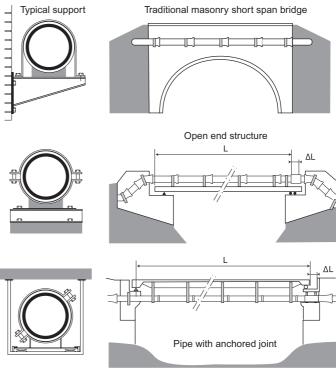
Pipe laying at a crossing (Pont-a-Mousson, 1992).
